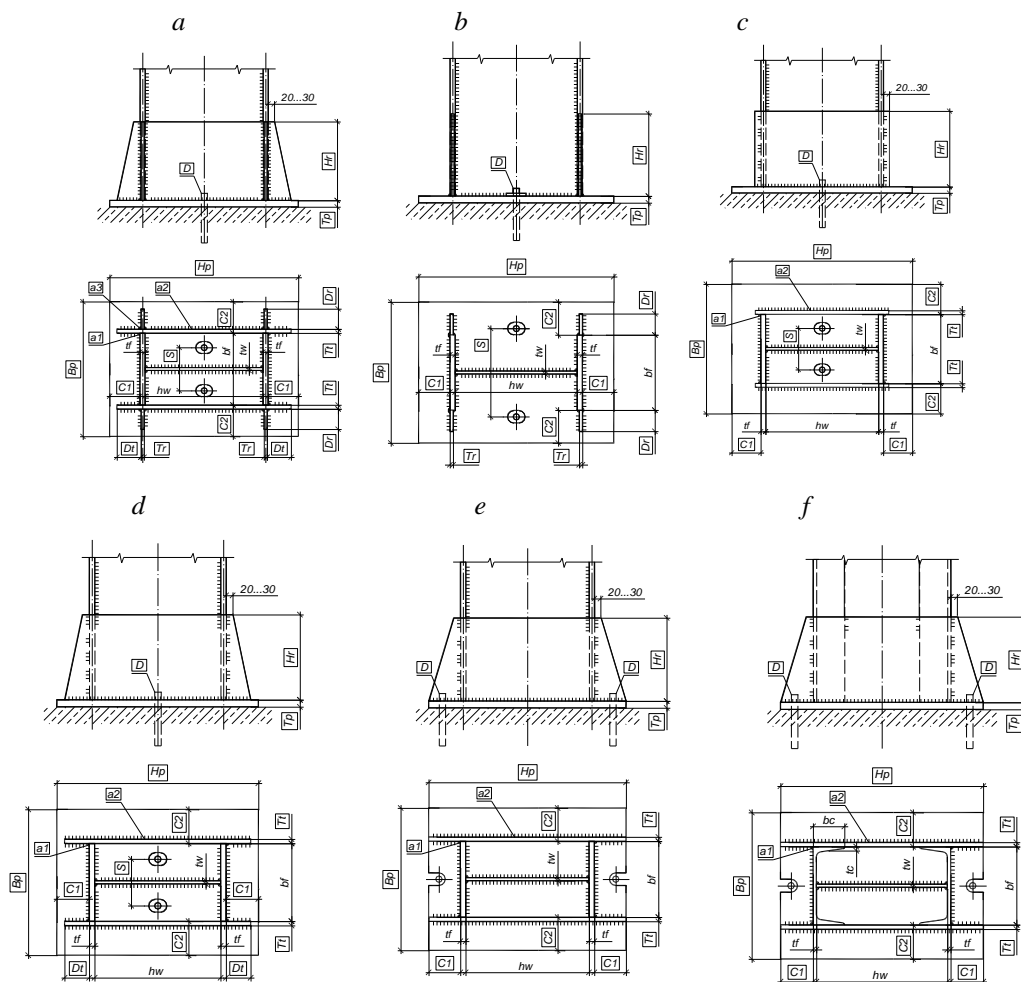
Types of designs for nominally pinned column bases with wing plates and cantilever stiffeners
